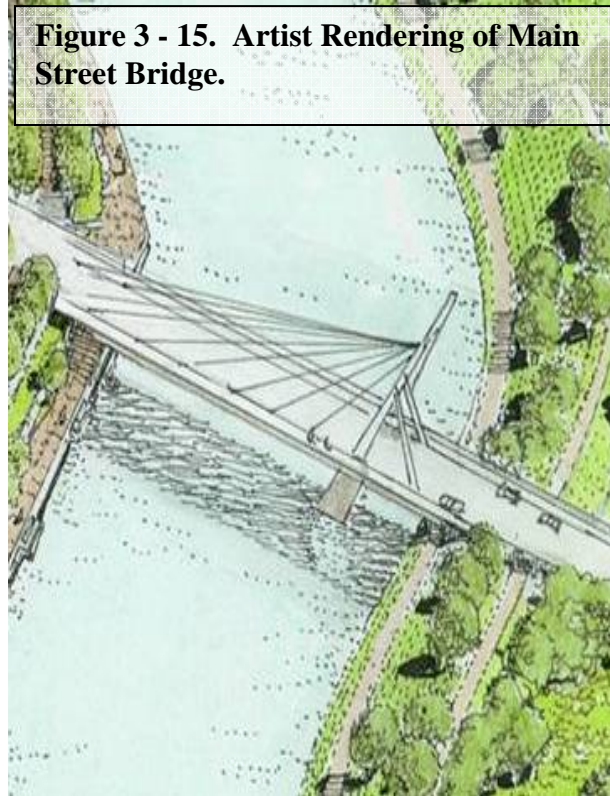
15. Artist Rendering of Main Street Bridge.
